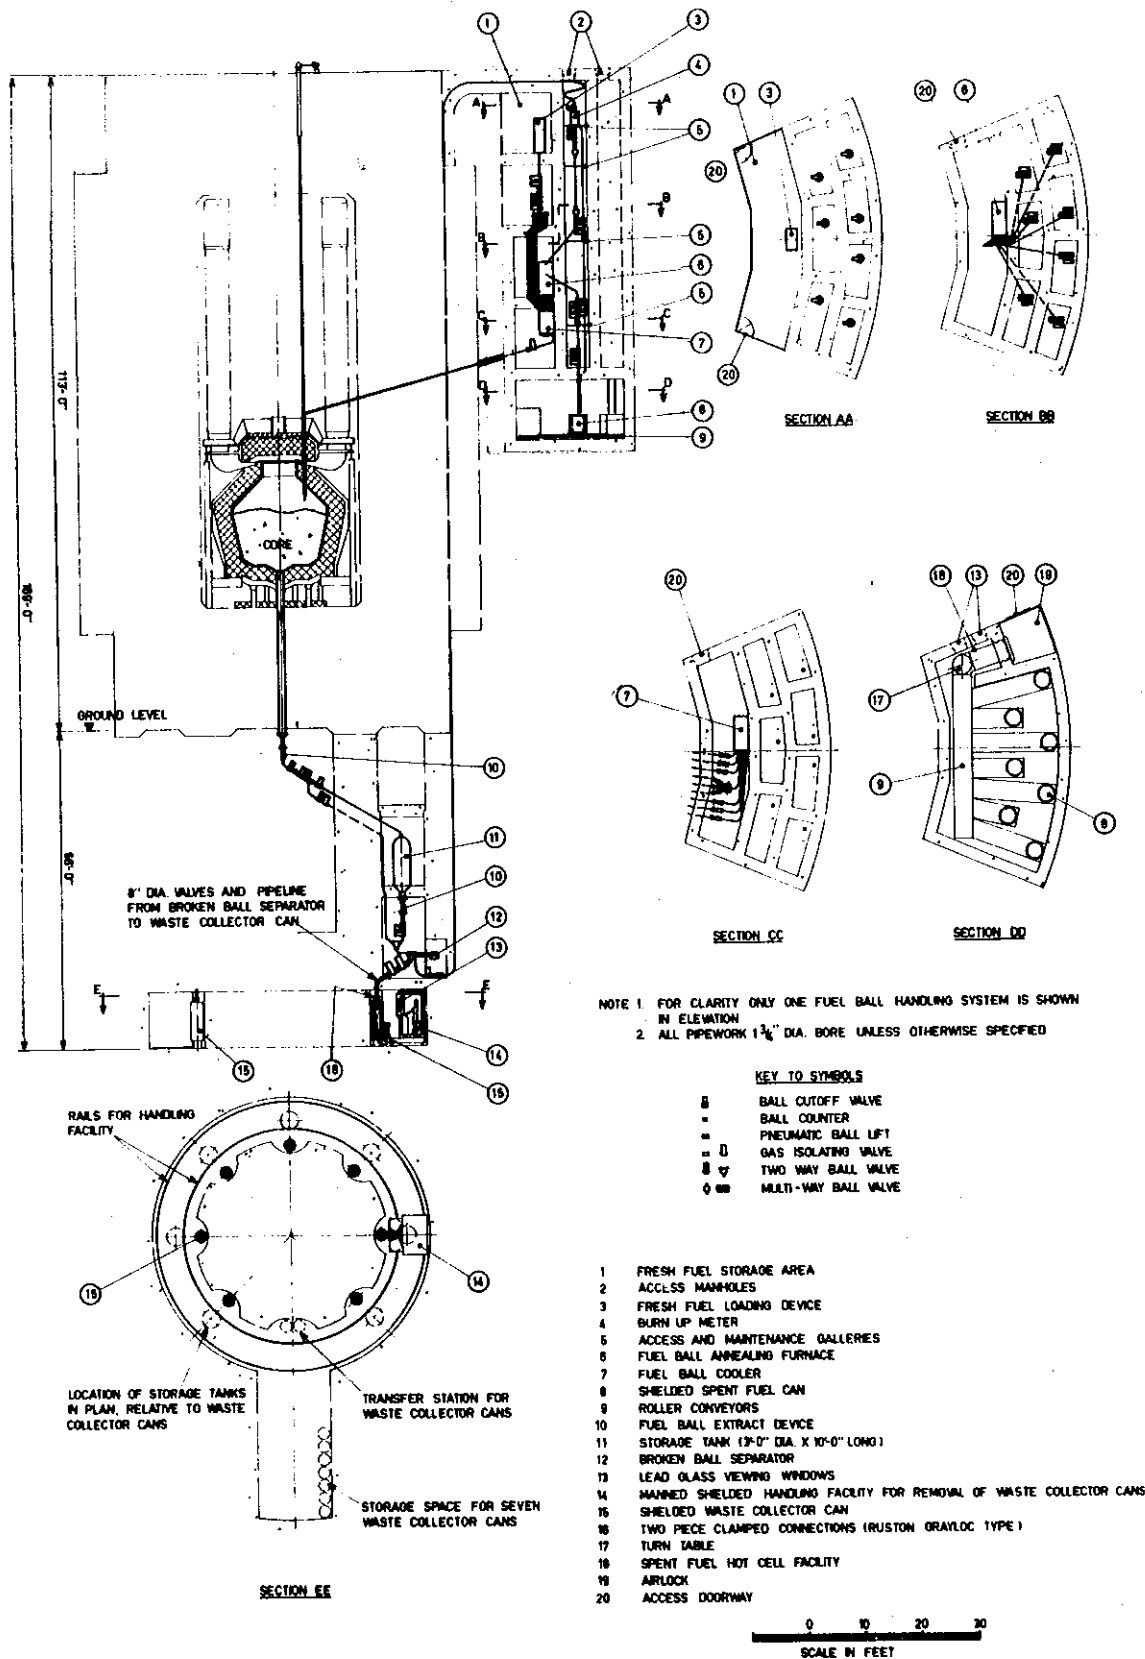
LAYOUT OF HANDLING SYSTEM FOR A P.B.R.
